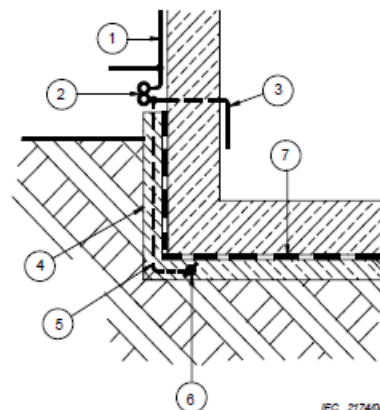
Isolated foundation with foundation earth electrode in the non-reinforced concrete layer below the bitumen insulation
